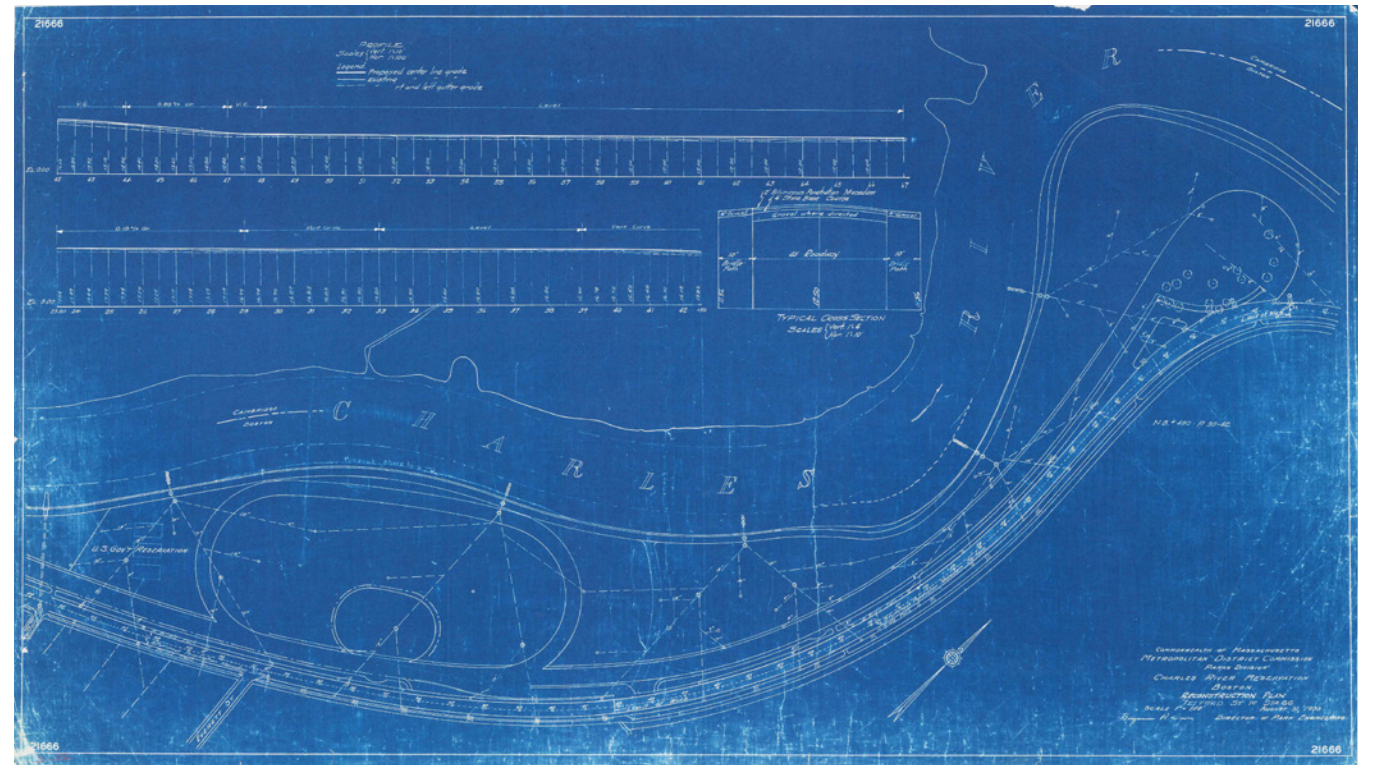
1933 Reconstruction plan for the Speedway, showing a typical cross section with 40' wide roadway and 10' wide bridle paths on each side. Plan courtesy DCR.
